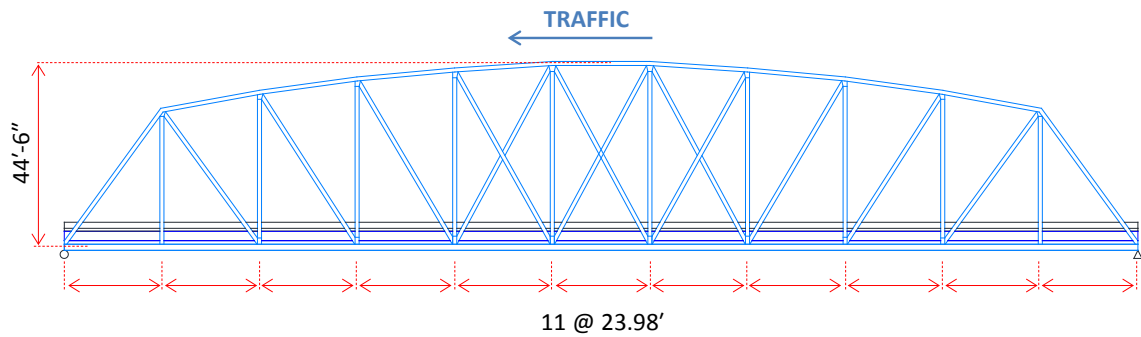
Dimensioned elevation view of the fourteenth span of the northbound I-5 Columbia River Bridge.
